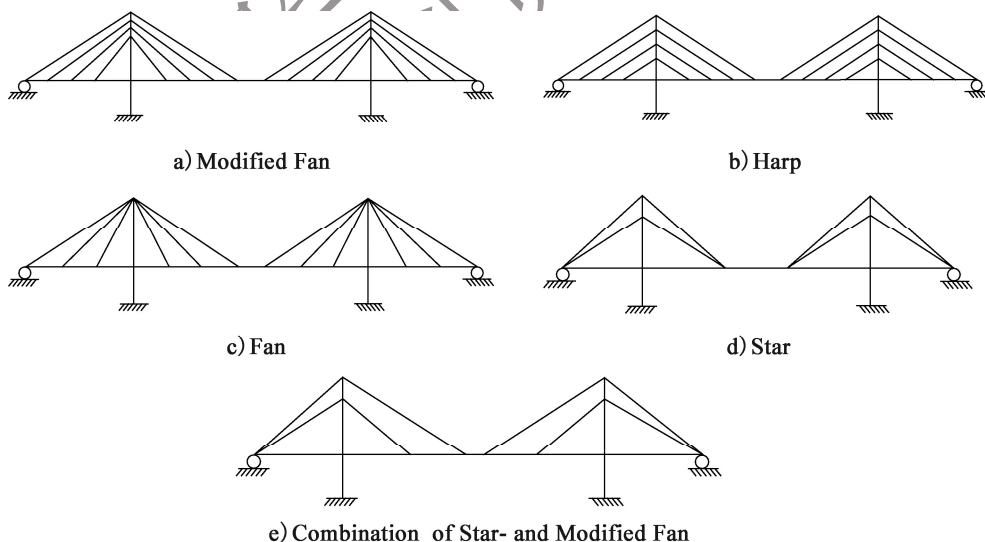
Arrangements of stay cables in the longitudinal direction of a cable-stayed bridge
